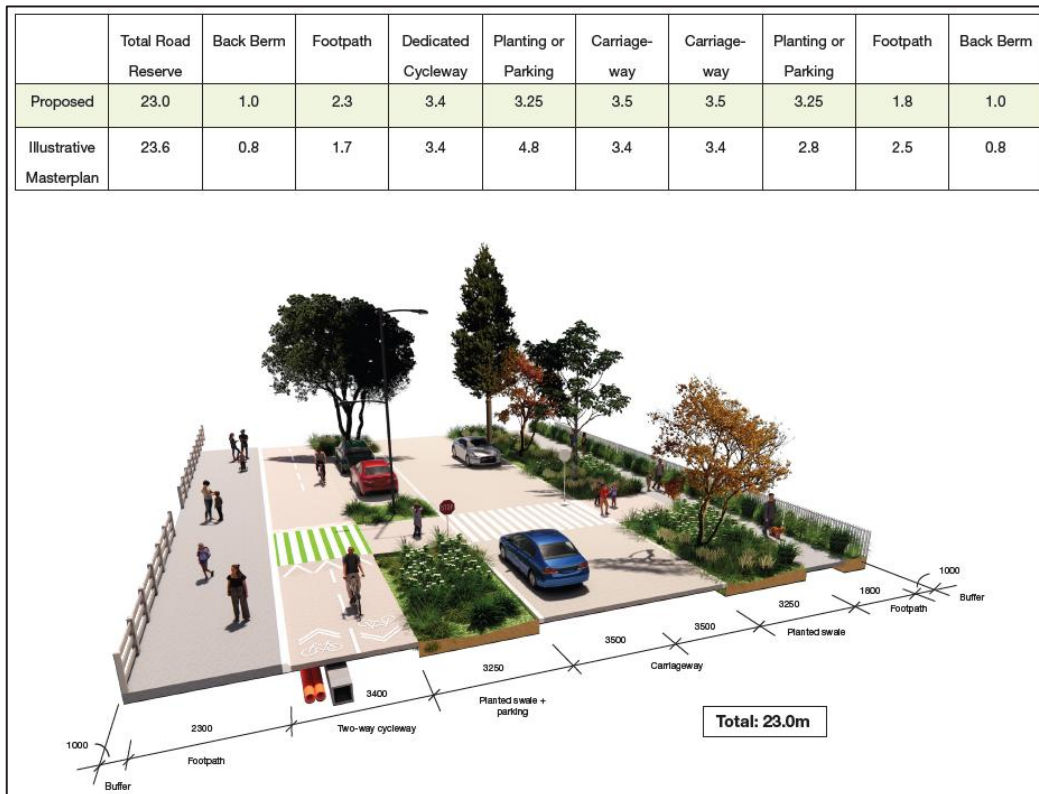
Road design table and illustrative cross-section for Primary Collector Road (School).
